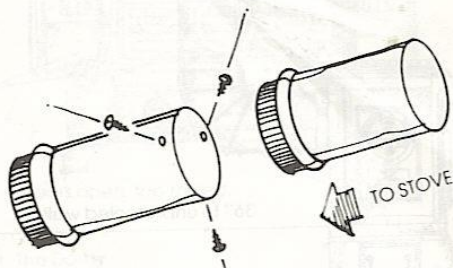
Secure each joint with three sheet metal screws. Head joints away from the stove, so any condensing tars will drip back into the stove.
